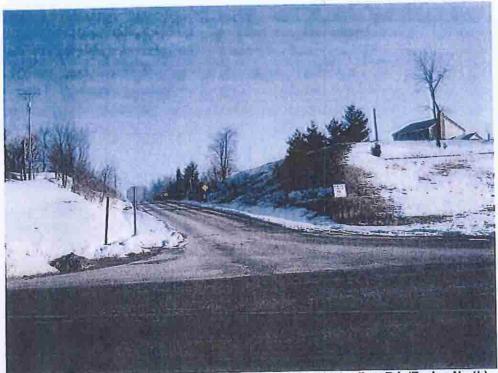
Supplement to Figure 3: Intersection S.R.29 & Ludlow Rd. (Facing North)
